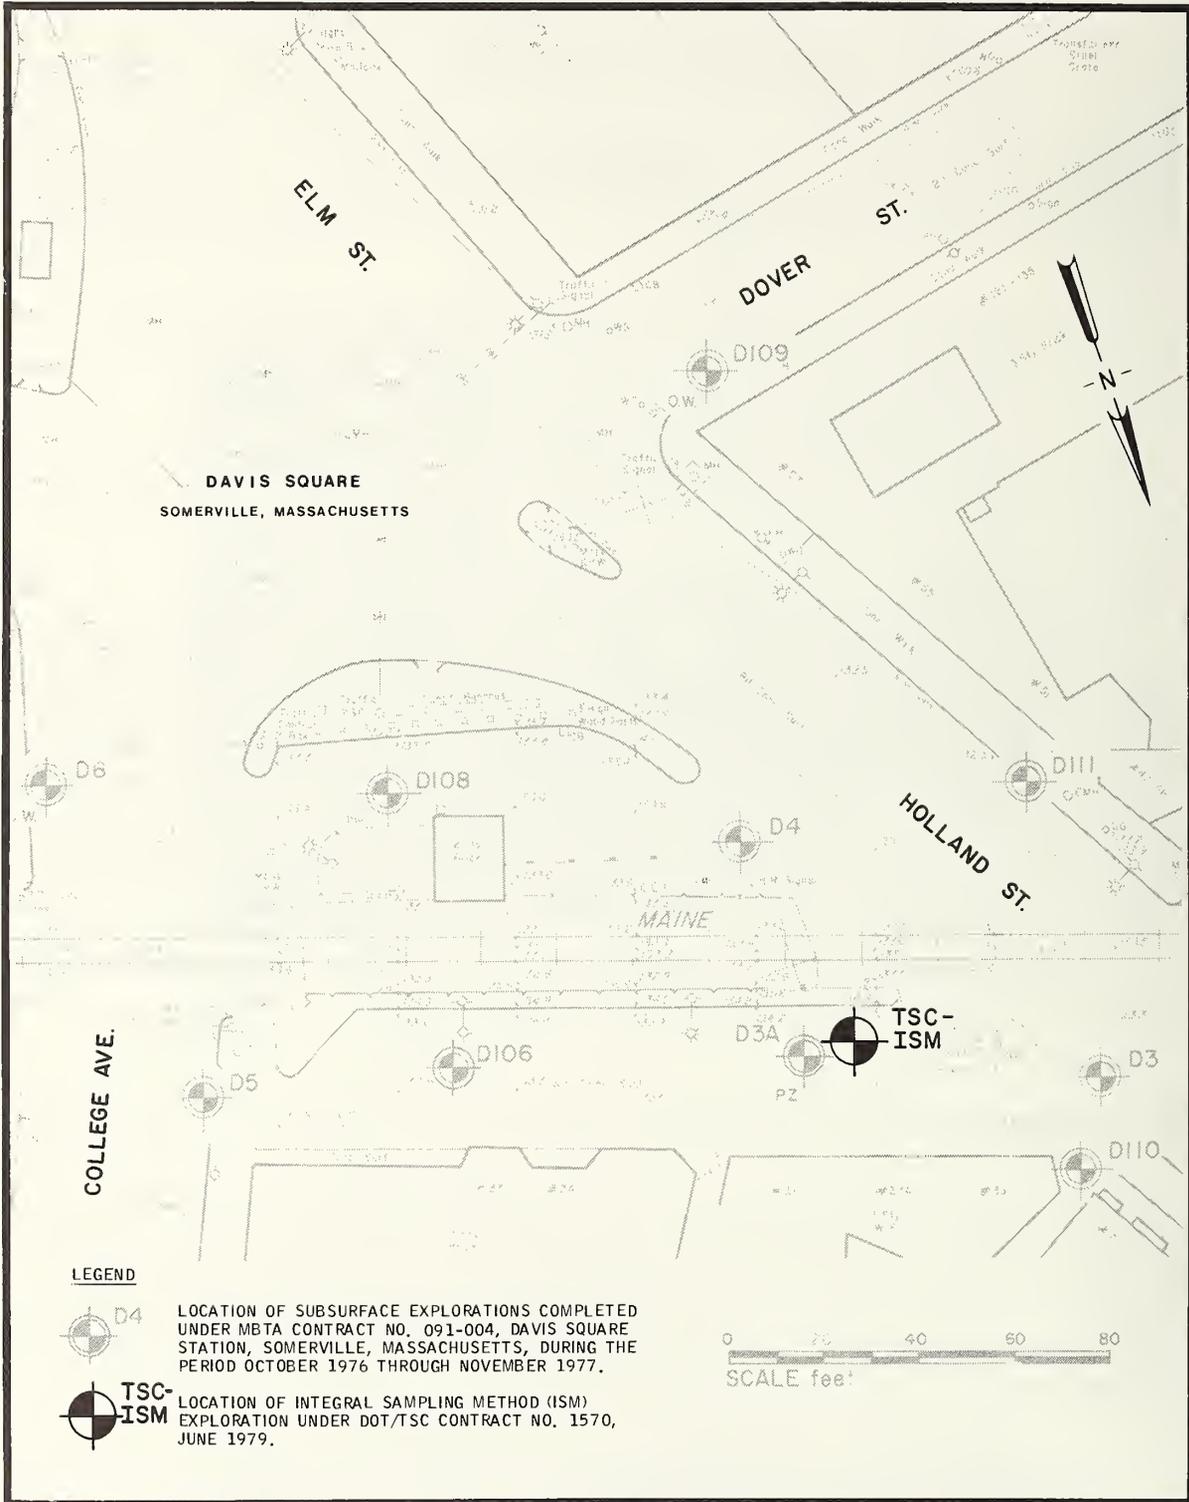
SUBSURFACE EXPLORATION PLAN, DAVIS SQUARE SITE, SOMERVILLE, MASSACHUSETTS
